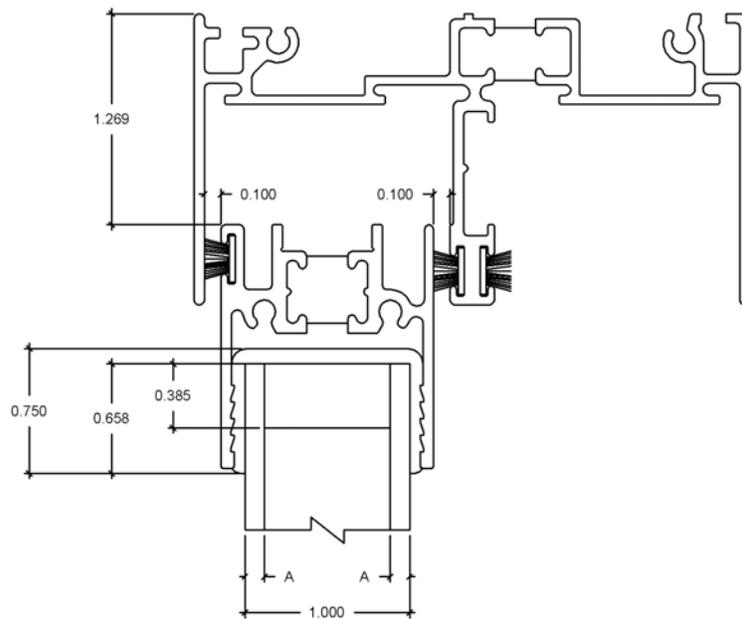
Dimensioned drawing for the meeting rail cross section.
